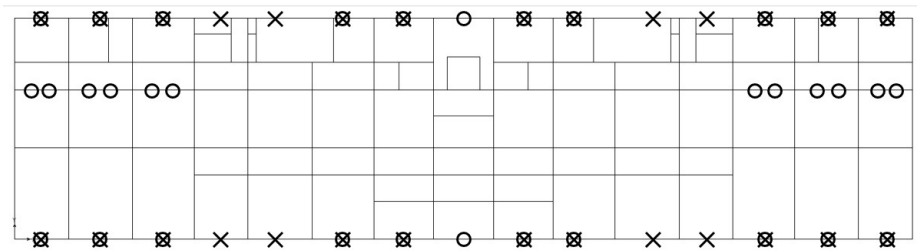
Damper Placement at 2nd floor (SR-X); ODAM: 12 dampers
